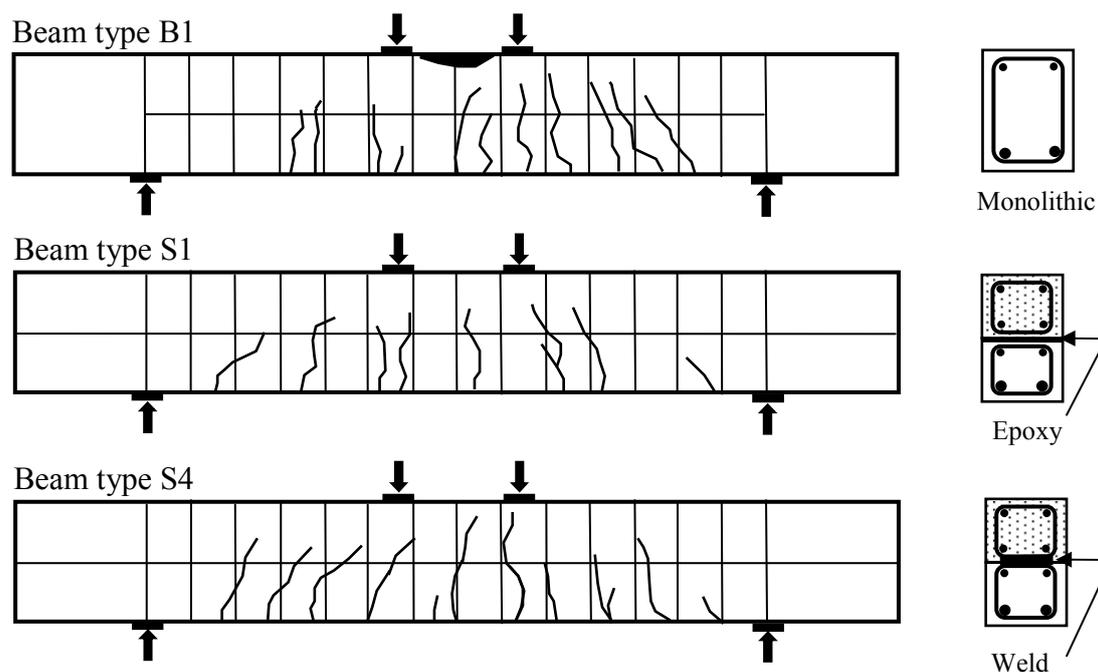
Crack patterns at working load level for beam types B1, S1 and S4.
